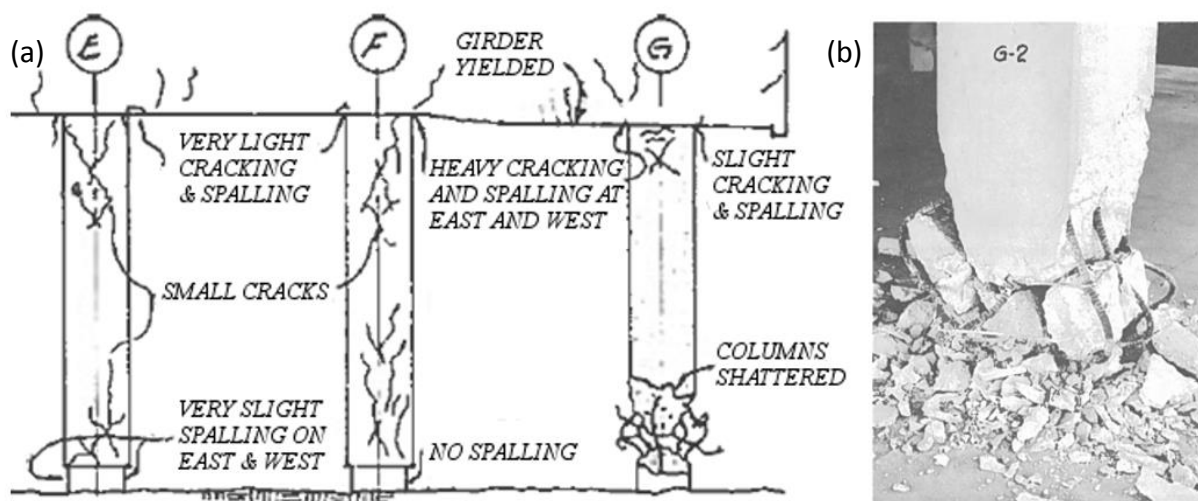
Illustrations of damage showing: (a) detailed damage description of frame line 1 at the first story; heavy shear cracking and minor spalling is apparent at the base of the first-story columns; (b) damage to columns on grid line G resulting in 9 in. of shortening of eastern-most bay (diagram and picture from [16]).
